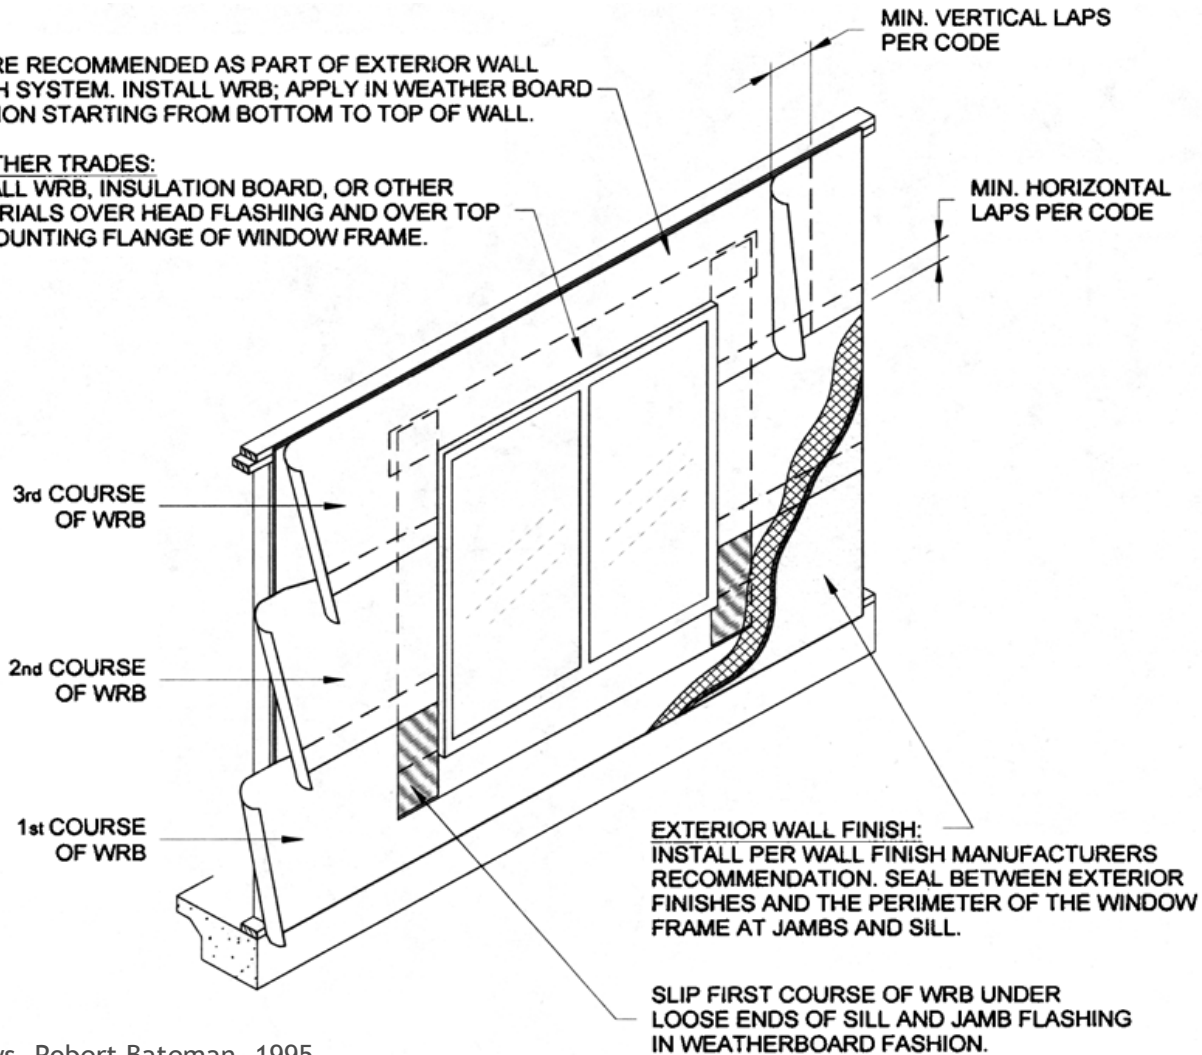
Surface Barrier Wall (Head and Sill Detail)
